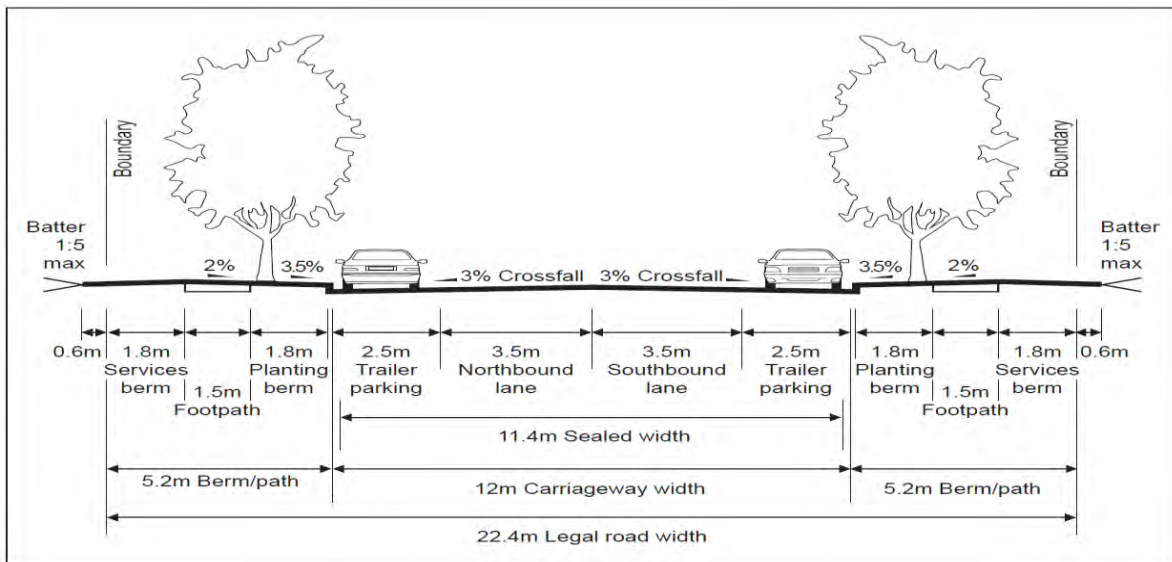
Proposed road east of Clevedon Sub-precinct D
